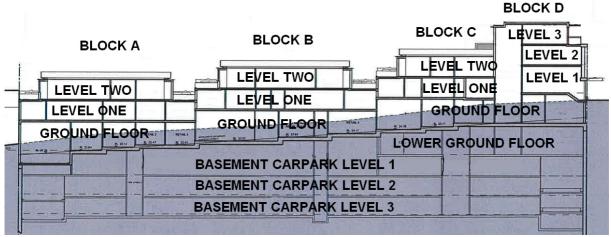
A cross-section (Section C-C) through the development showing the floor levels proposed. References to Blocks A,B, C and D are used throughout this report.
